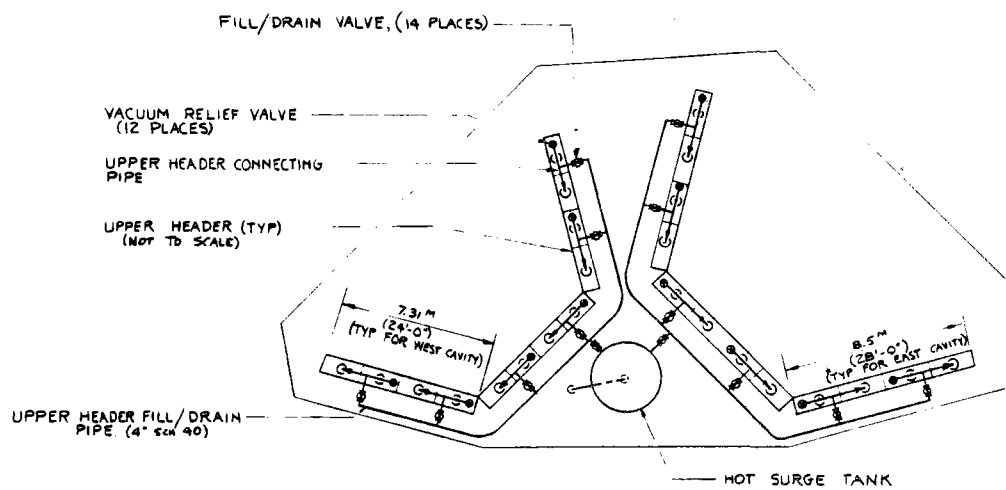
Plan - Upper Crossover & Vent Piping
